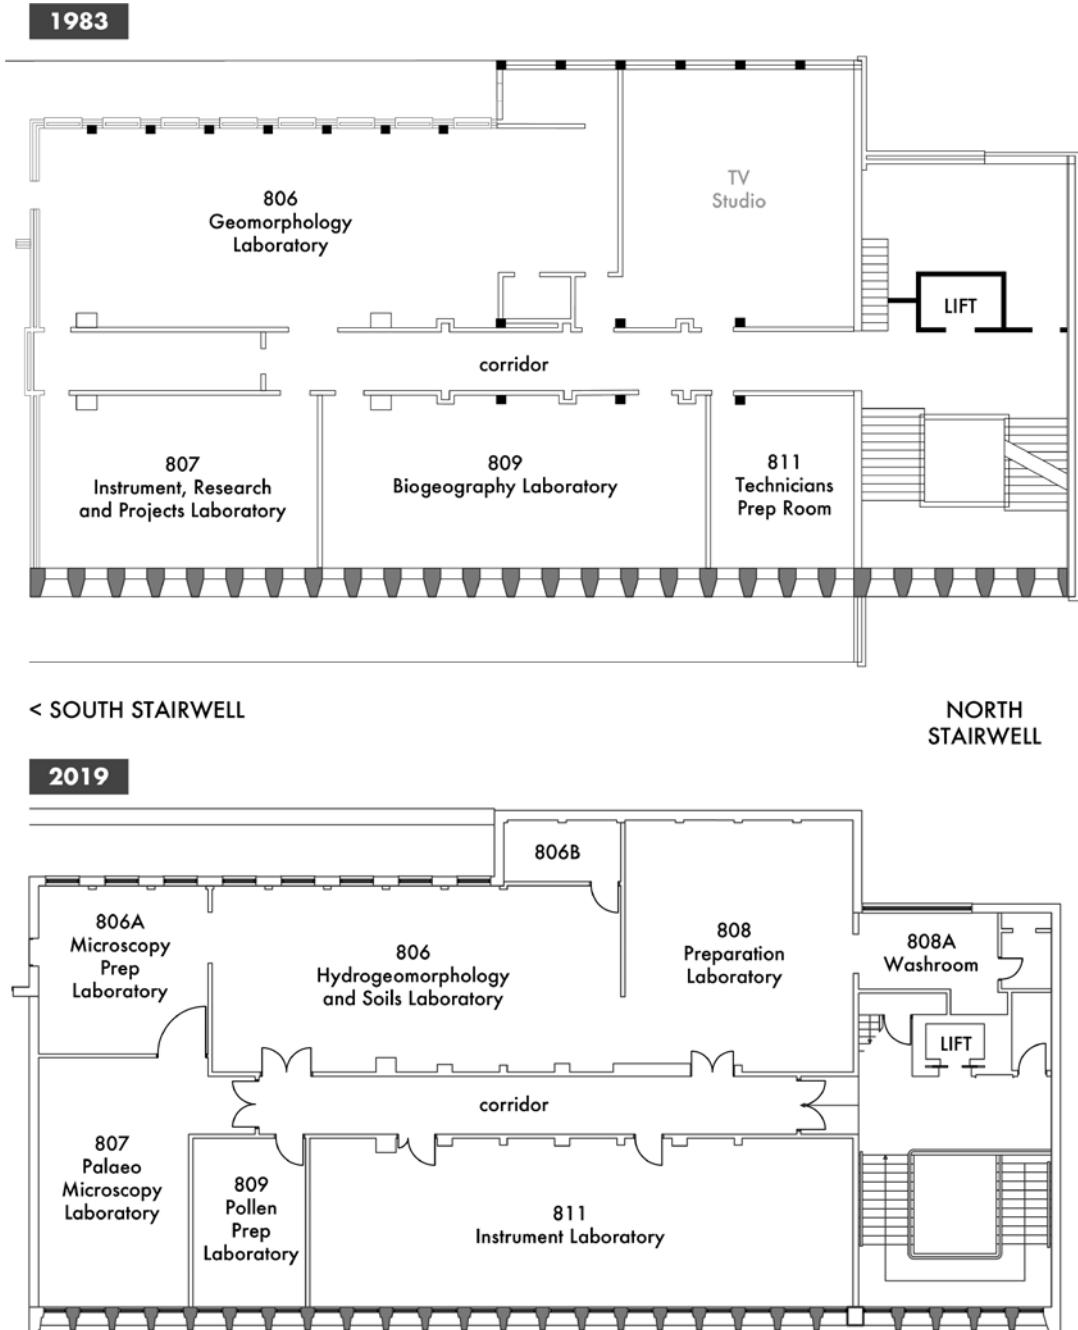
The layout of Geography’s space on the 8th floor of the Davy Building, 1983 and 2019
